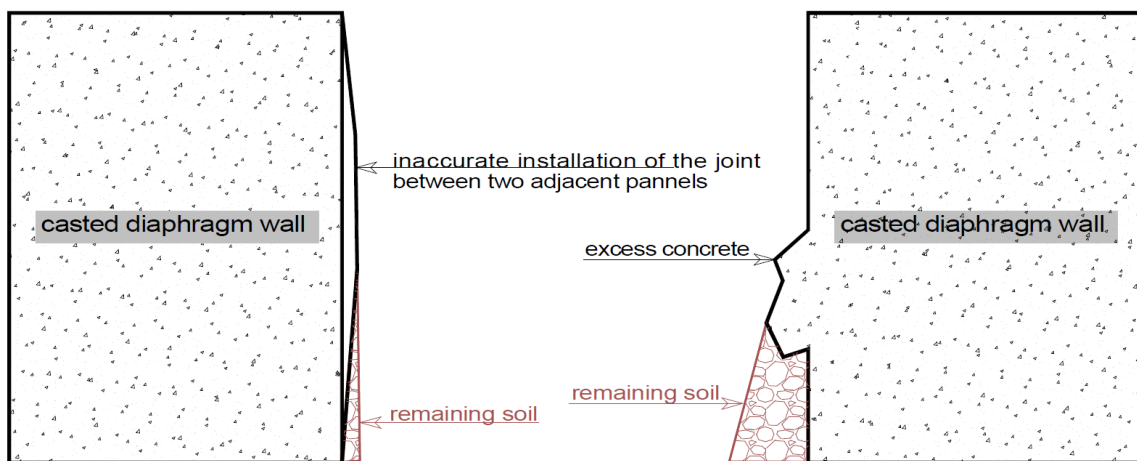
Deviation due to excess concrete (left) deviation due to miss-aligned joint element (right) for excavation of Diaphragm walls
